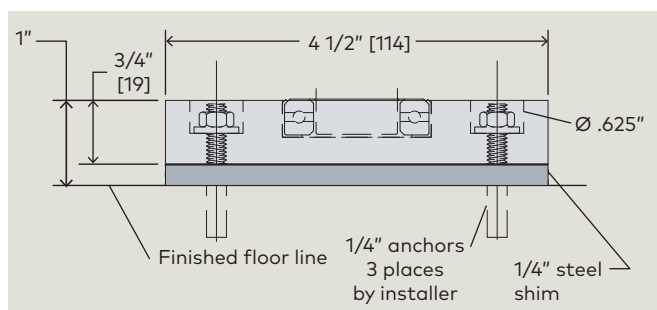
Floor surface-mounted pivot assembly installed on floor
